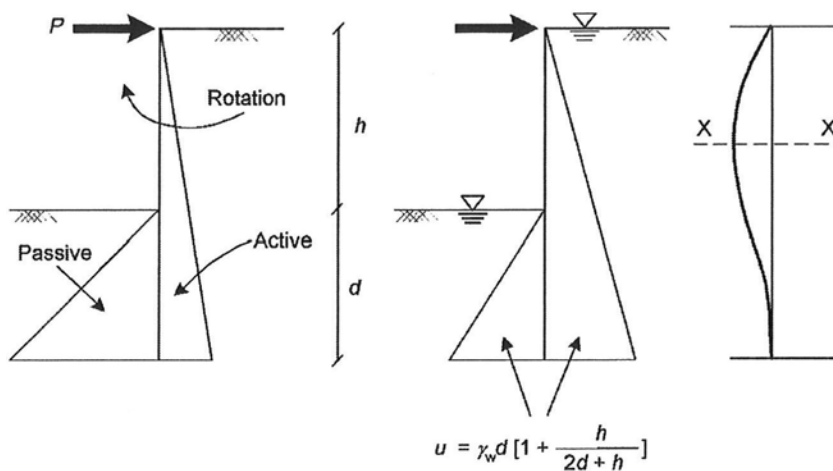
ULS Earth Pressure Diagram, Propped Wall including Bending Moment Profile
